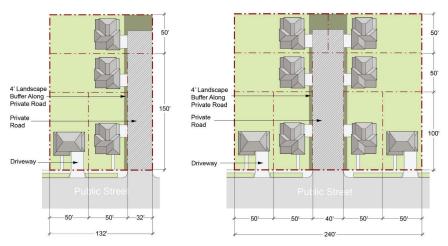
Subdivided parcels oriented towards the public right-of-way, and parcels oriented towards a private road.
